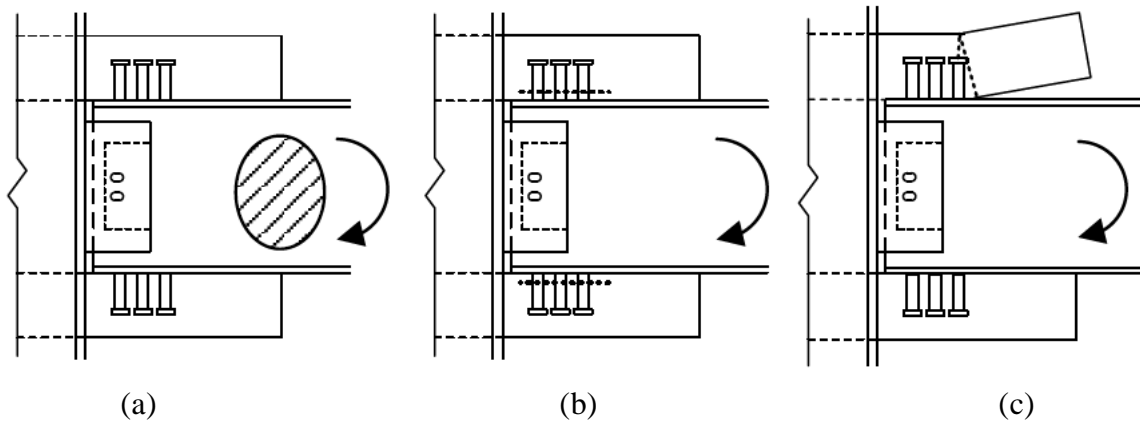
Failure mode: (a) Beam yielding, (b) Stud fracture, (c) Slab bending failure
